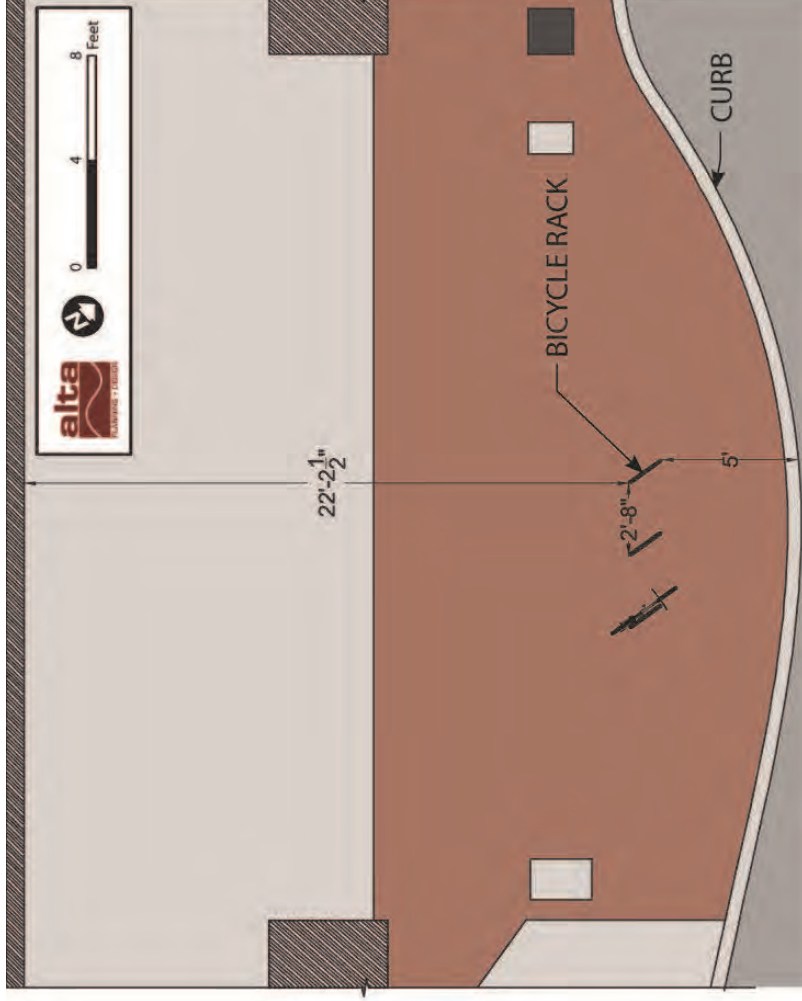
3rd Avenue and Ellsworth Avenue Bicycle Parking Plan View
